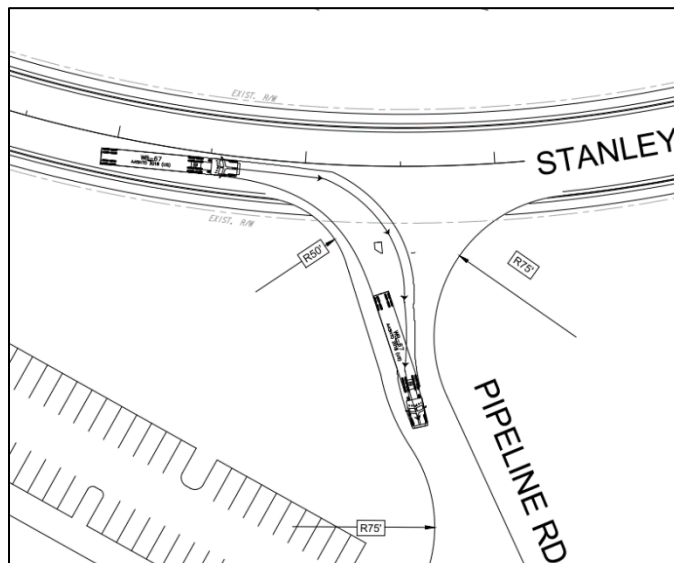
Stanley Road at Pipeline Road – Eastbound Right (Entering Truck)
